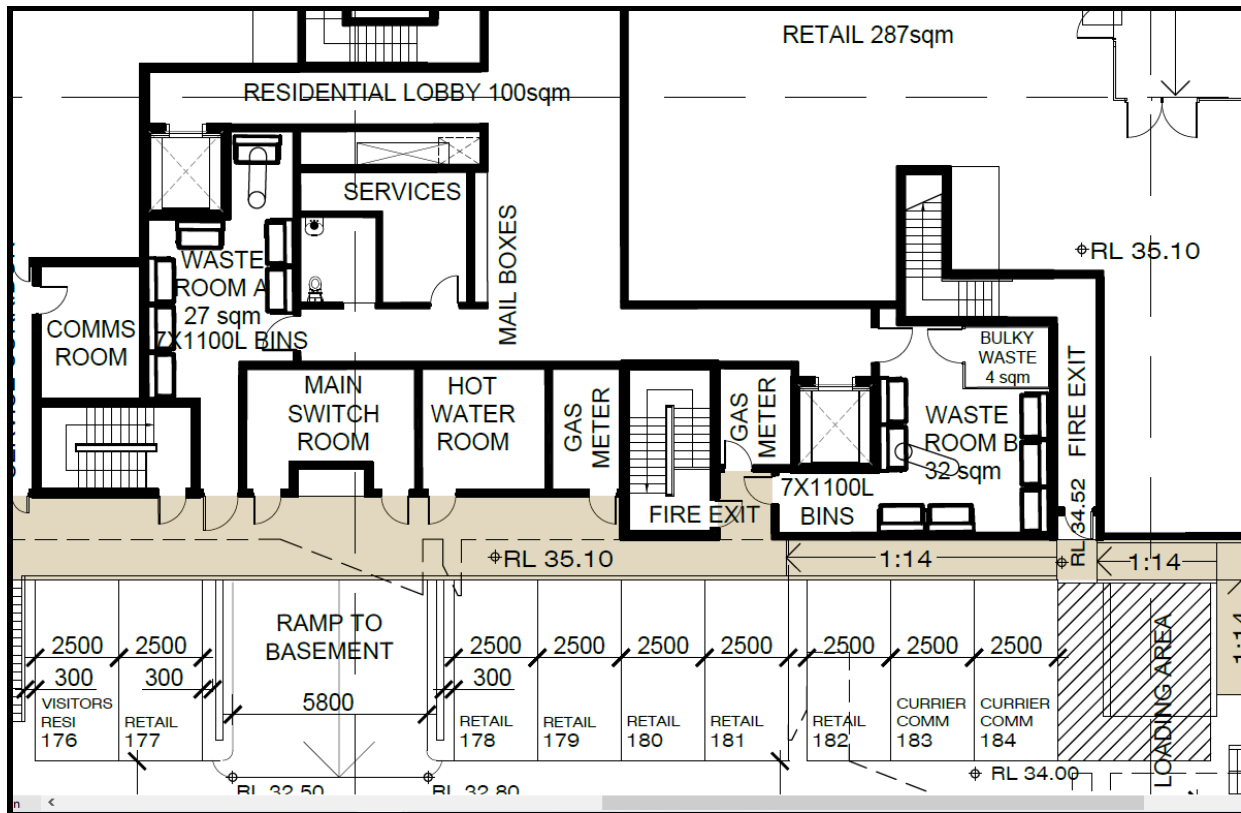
Proposed Waste Rooms A and B (Source: Marchese Partners, July, 2020)
